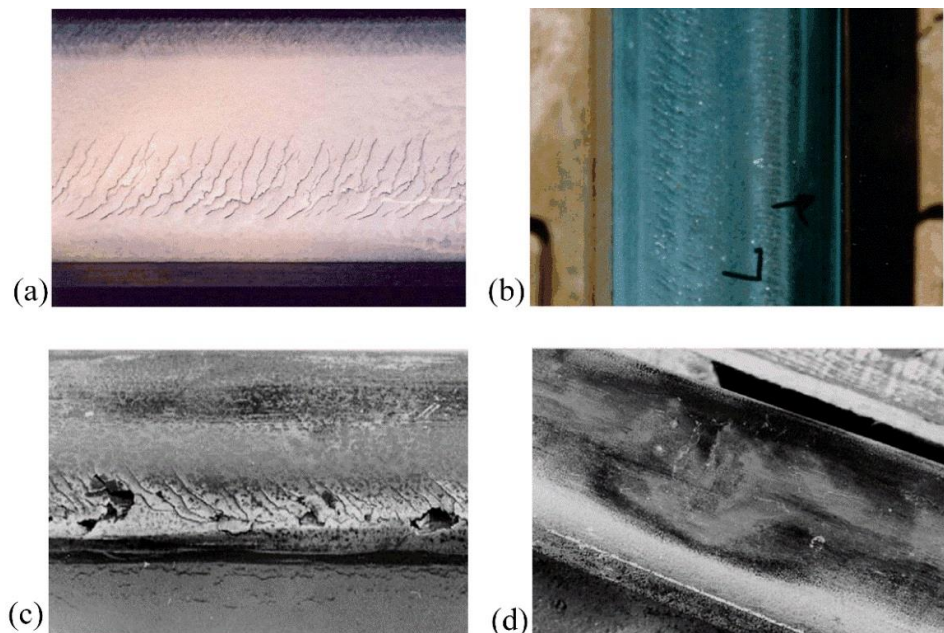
Typical RCF defects: (a) and (b) well defined gauge corner cracking and head checking [1]; (c) spalling originating at gauge corner cracks; (d) squat defect on the running surface [25].
